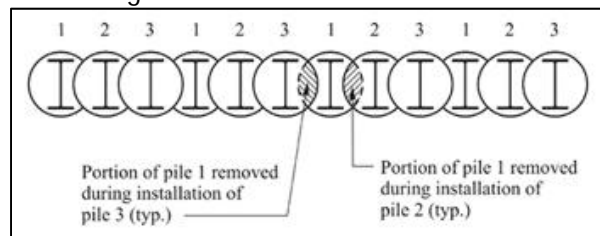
Secant Pile Wall at Barnsdall Shaft on Metro Red Line
